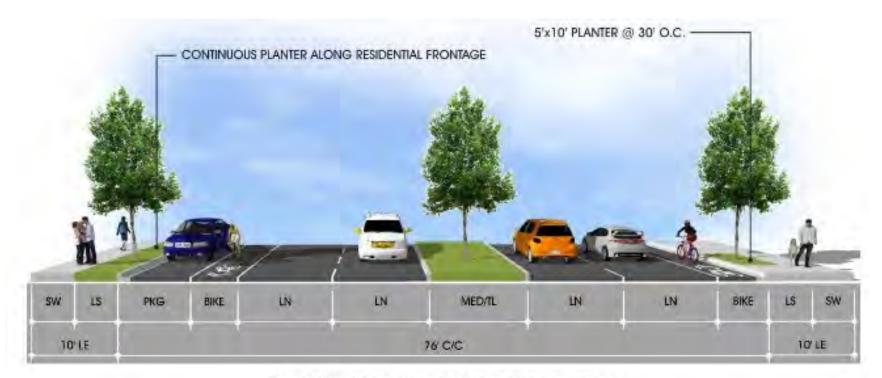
Proposed Complete Street Section: East Monte Vista Avenue
